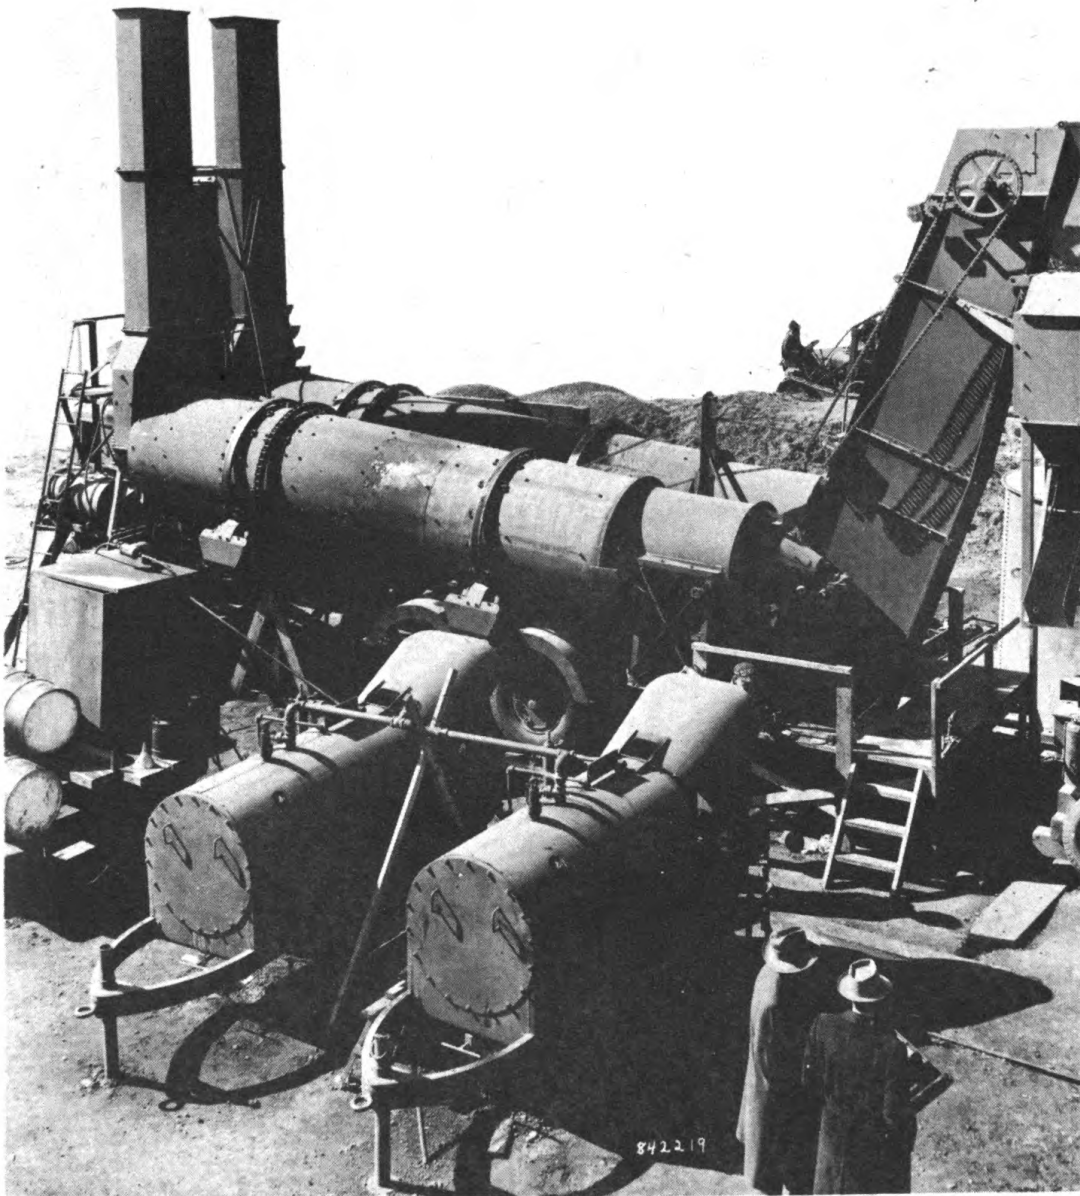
MODEL 833 DOUBLE DRUM DRYER USED IN CENTRAL PLANT APPLICATION.
